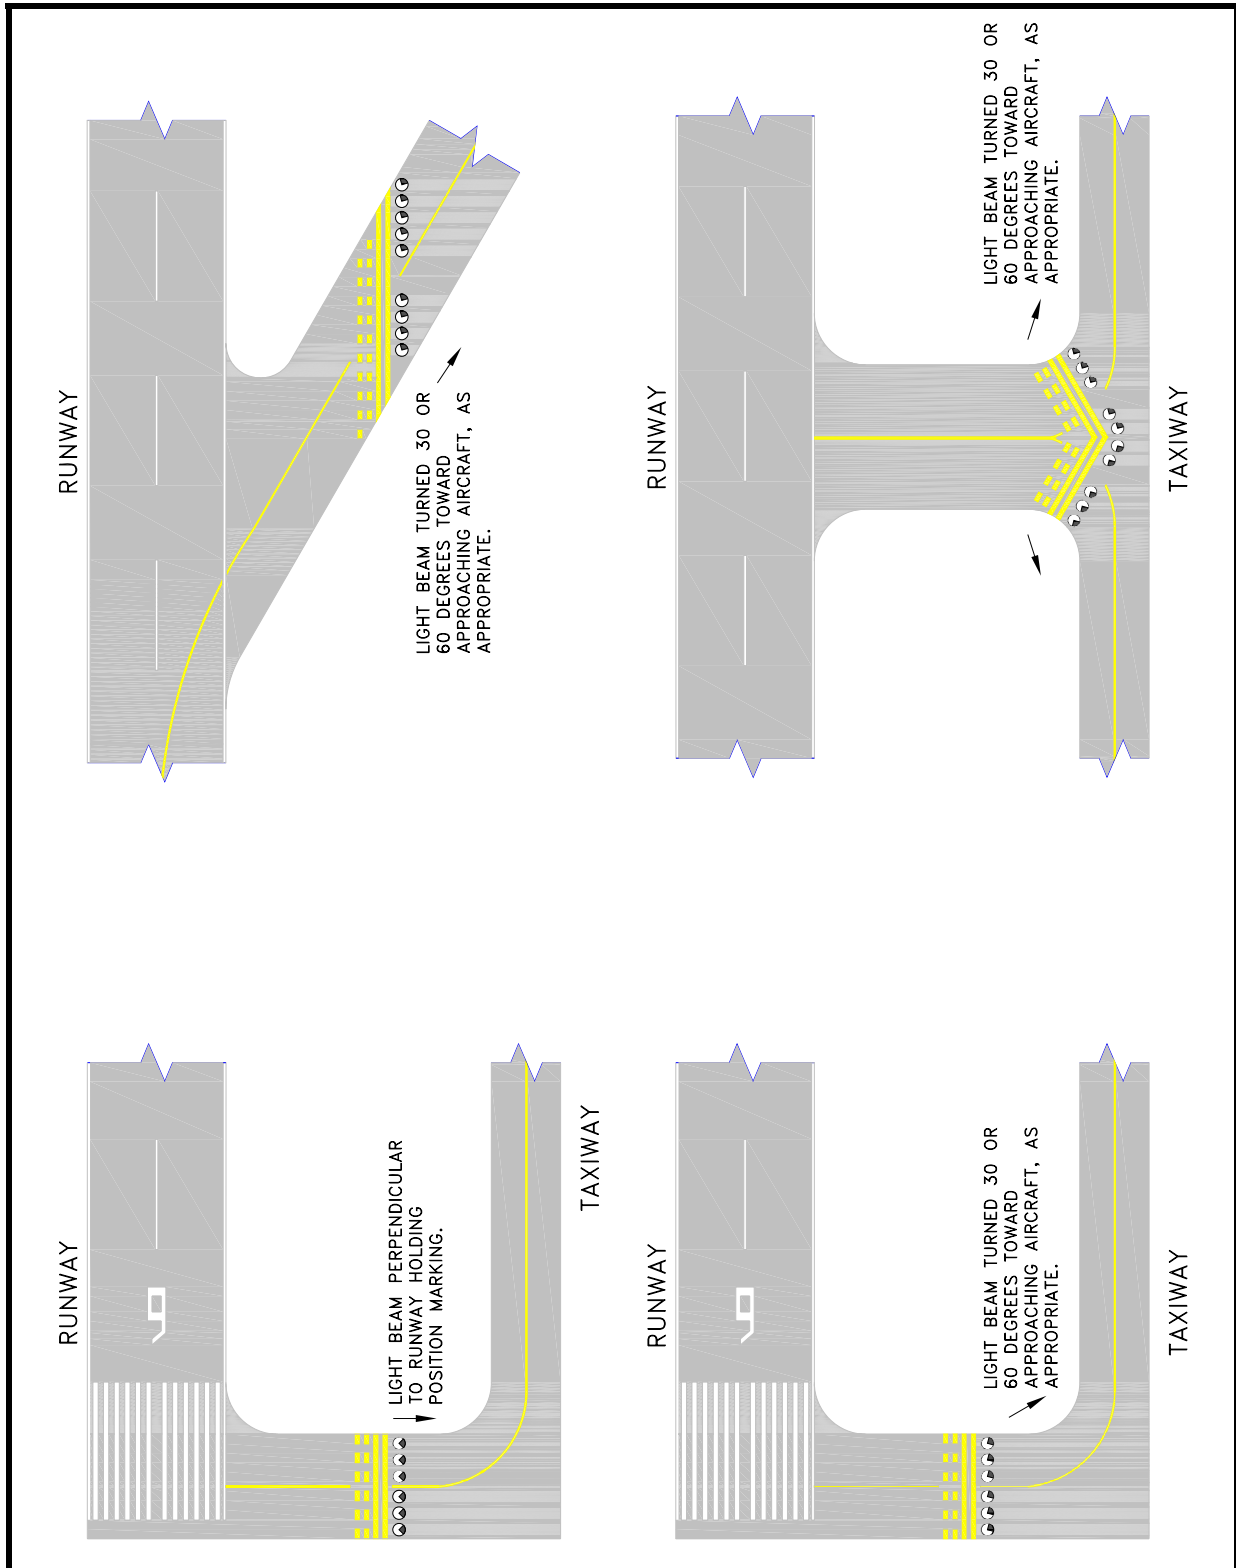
Typical Light Beam Orientation for In-Pavement RGLs and Stop Bars.
